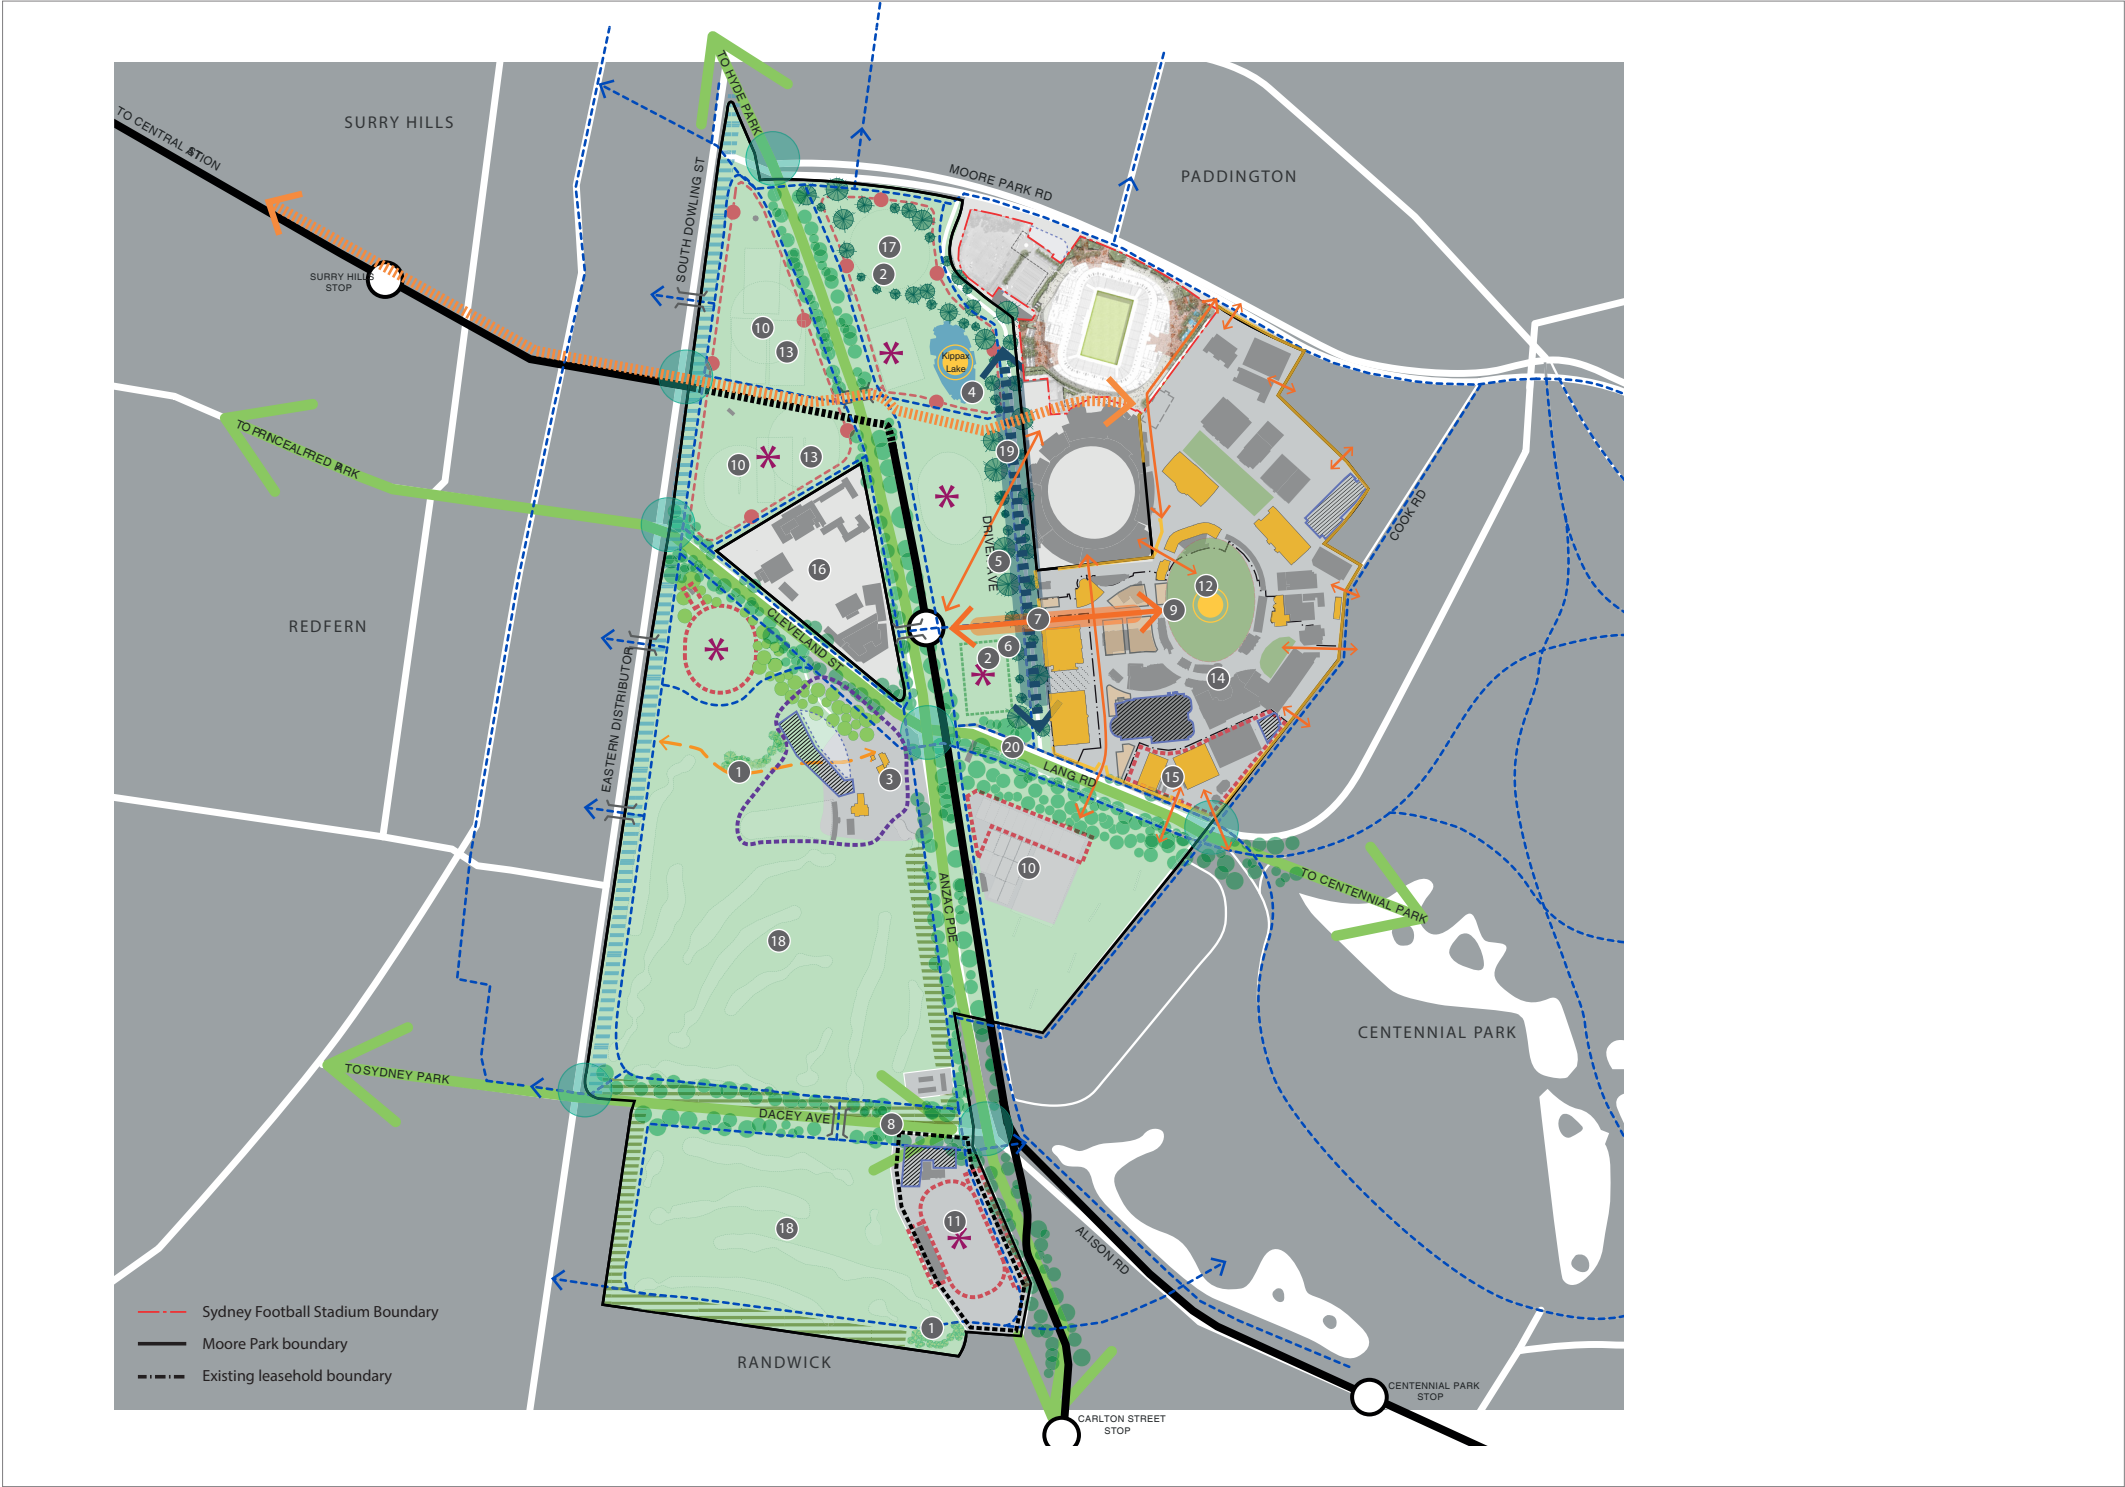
Moore Park Master Plan 2040 (Source: CPMPPT) with proposed SFS
